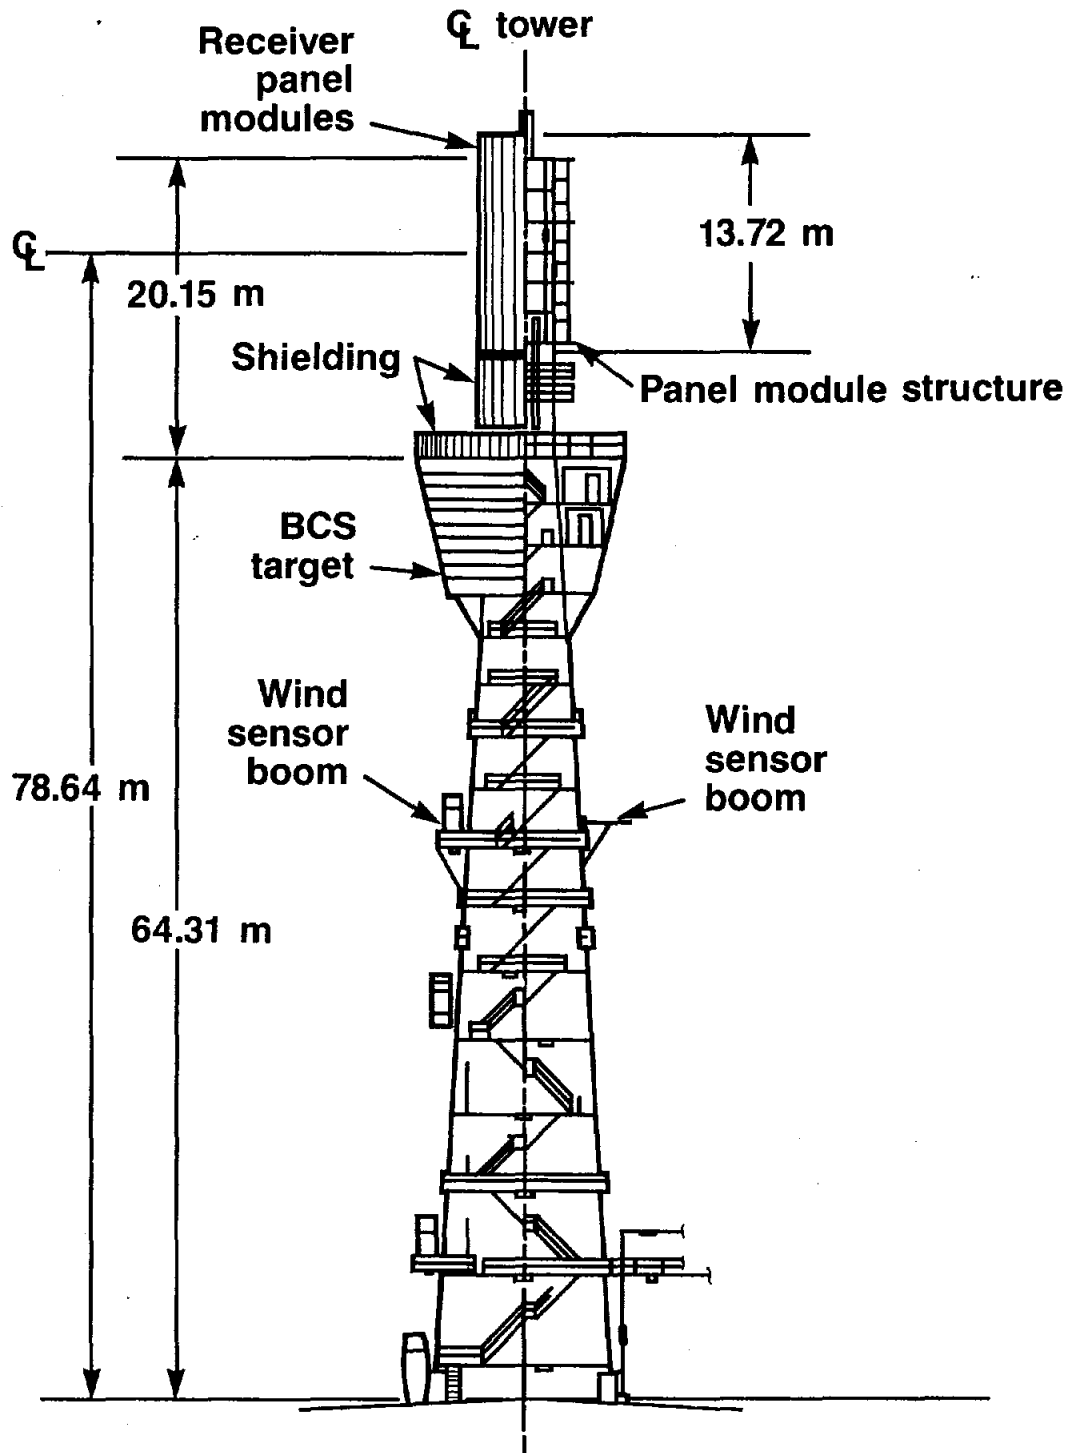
Drawing of the Solar One receiver on the top of the tower showing physical dimensions and equipment locations.
